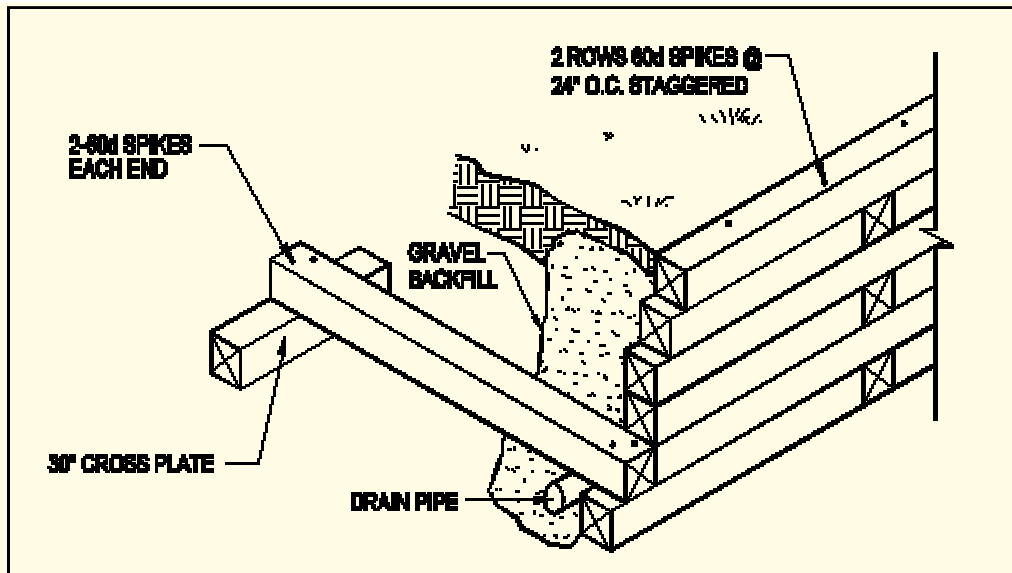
TYPICAL TIMBER RETAINING WALL DETAIL
